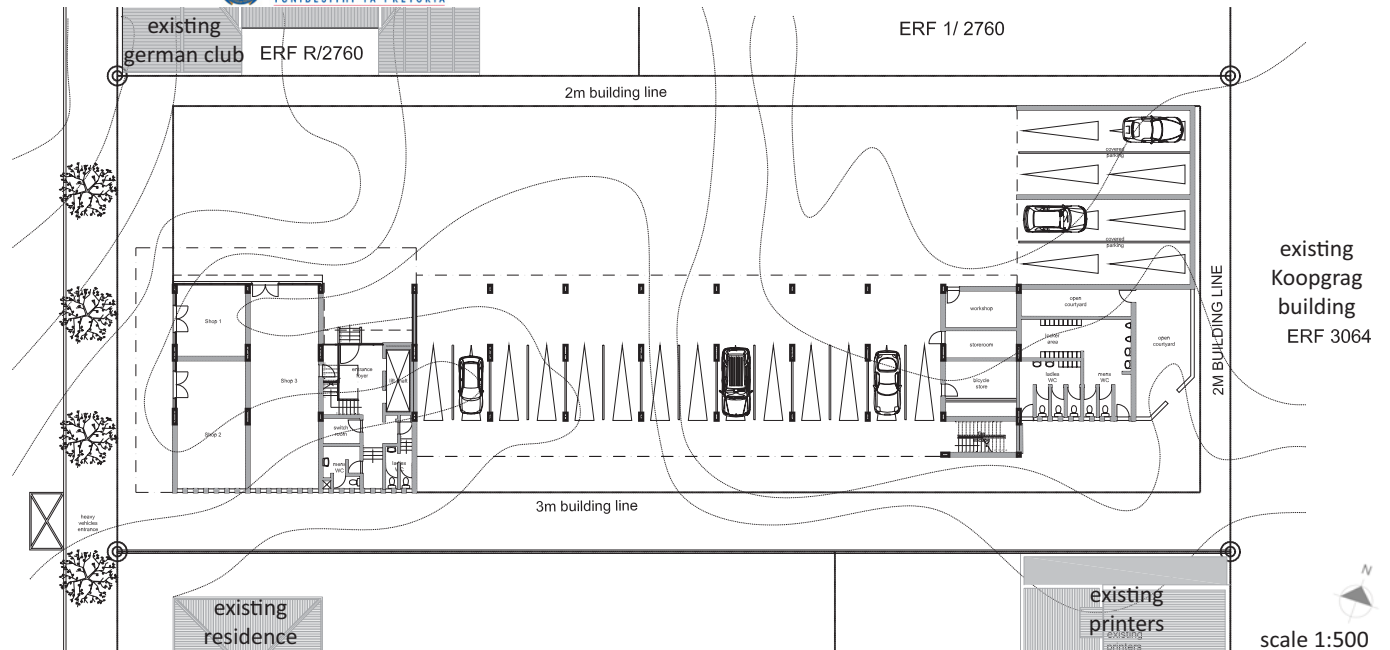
The ground floor plan of the Woltemade building as it appeared in 1955
